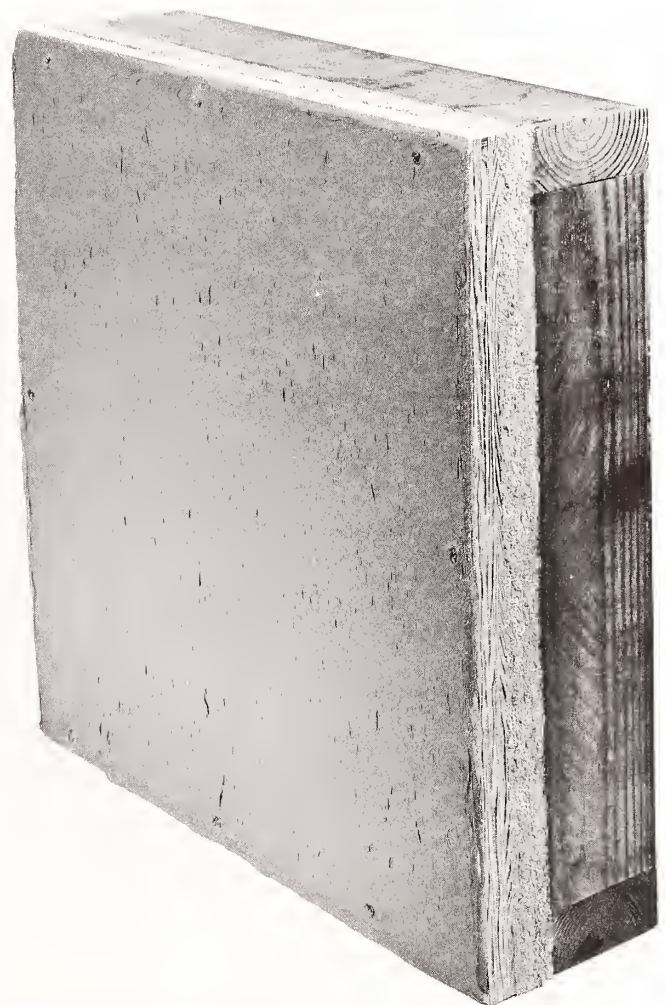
Coated plywood sheathed stud wall section for fire-resistance test.
